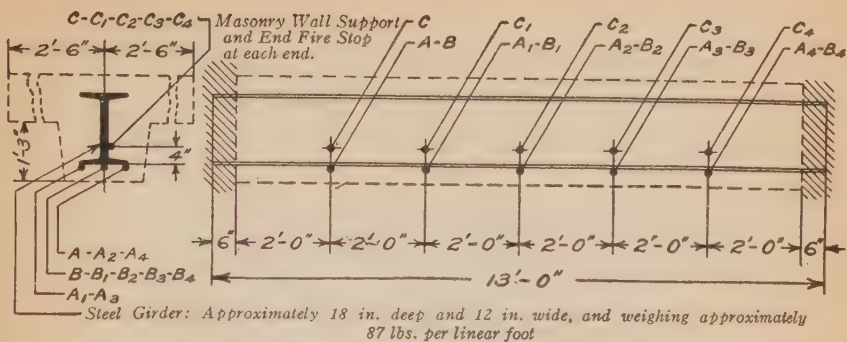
Girder Fireproofing Test for Paneled Ceiling
